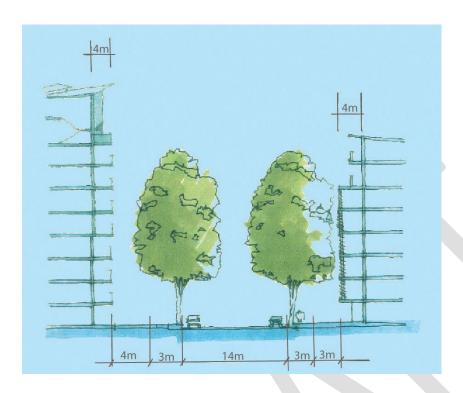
Type E tower element building as viewed from Morton Street looking north
